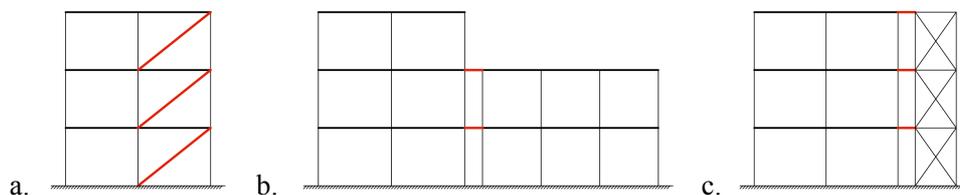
Ways to implement dissipative devices in the retrofit of existing buildings: a. between two adjacent storeys, b. connecting adjacent buildings, c. connecting building with lateral resistant walls
